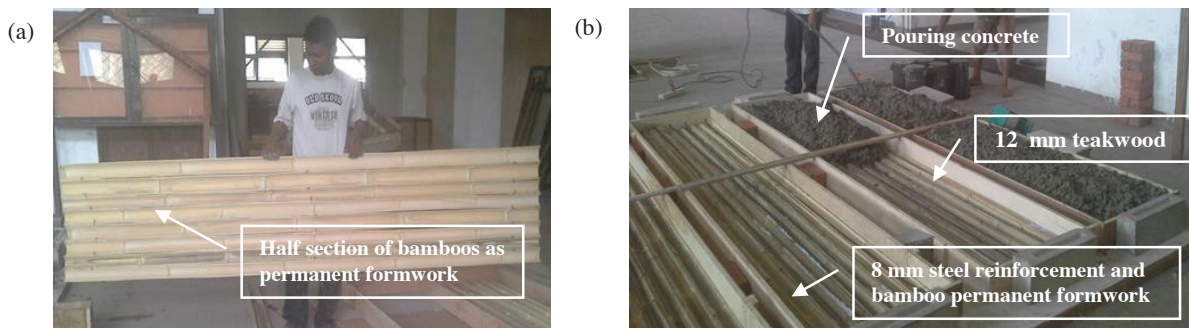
Specimen preparation: (a) bamboo permanent formwork; (b) casting of concrete slab
